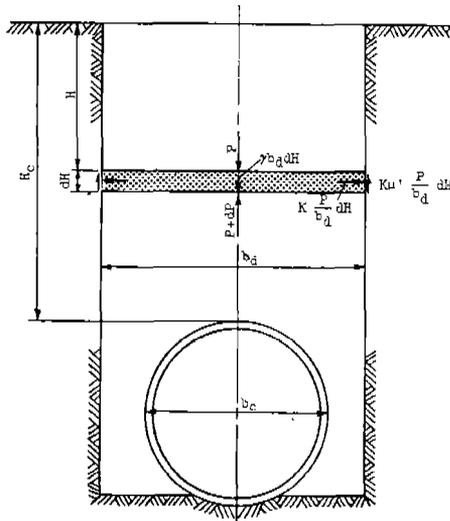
Loads on a horizontal element of the backfill material for a ditch conduit
